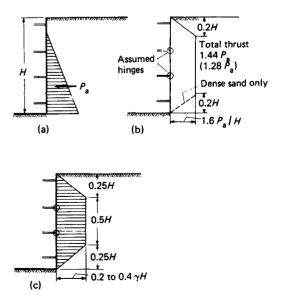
Earth pressure in strutted excavations. (a) Calculated earth pressure; (b) earth pressure distribution by CP2, based on Terzaghi's method; (c) stiff fissured clay. (After Terzaghi and Peck (1967) Soil mechanics in engineering practice. Wiley, New York)
